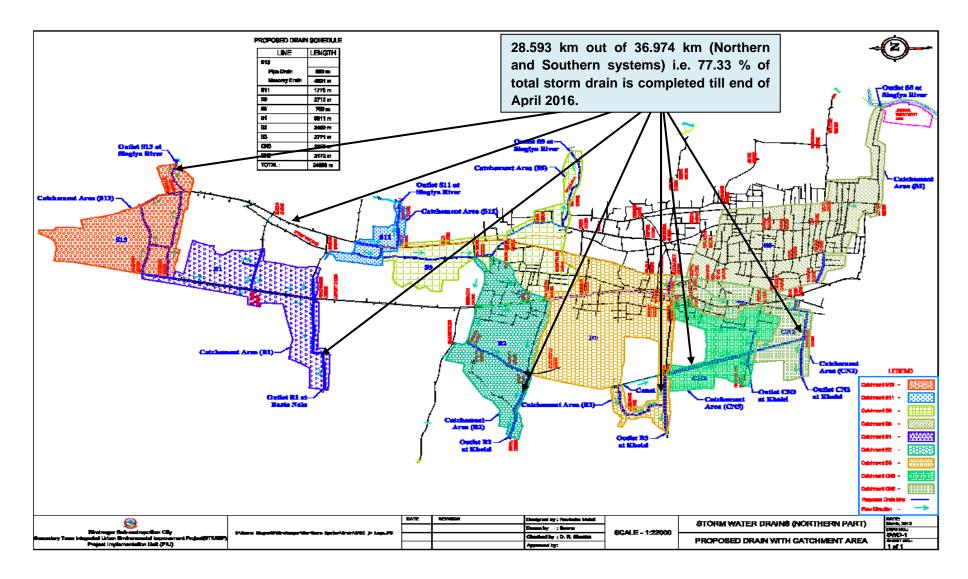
Proposed Storm Water Drains in BSMC (Northern Drainage System)
